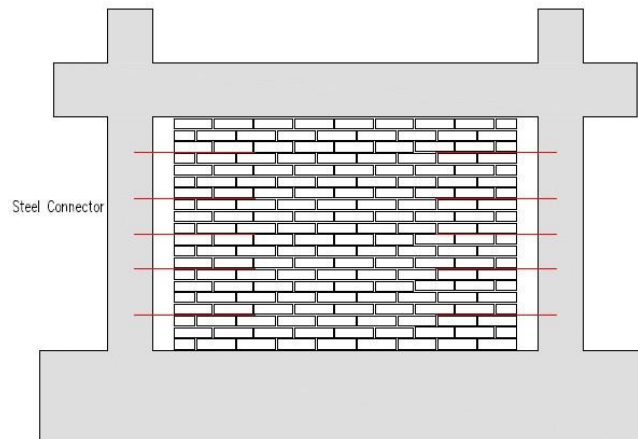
Column-isolated masonry infill wall with steel connectors (Kuang and Wang, 2014)
